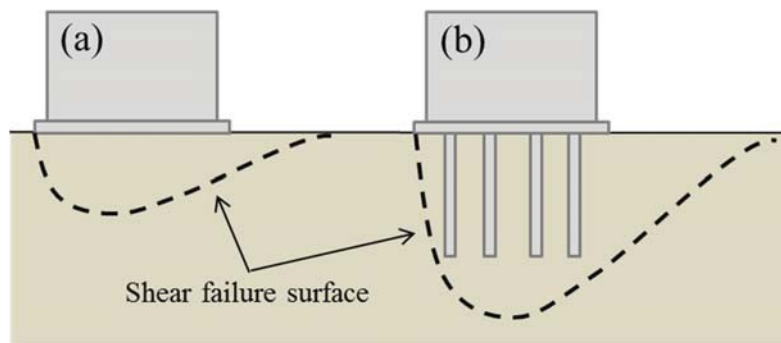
Shear failure surface, (a) Raft foundation, (b) Piled raft foundation.
